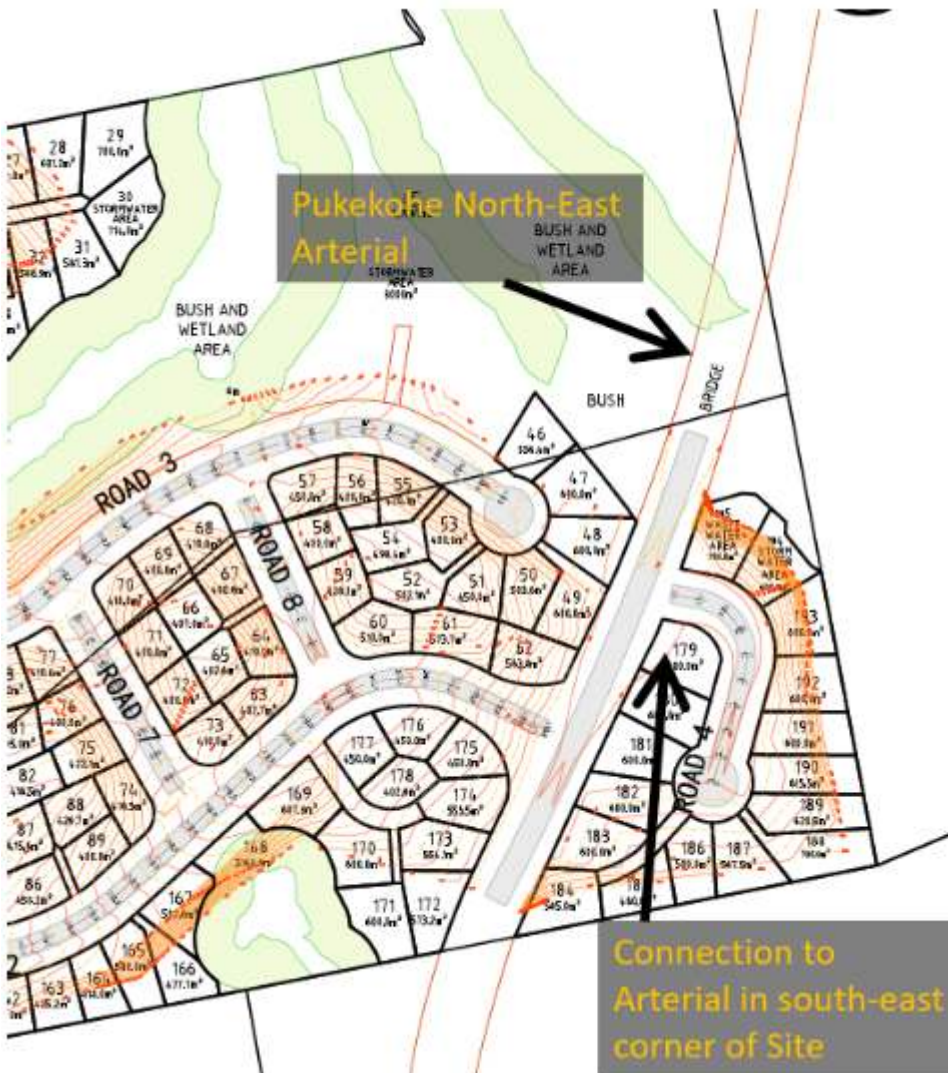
Proposed roading connection of Site to Pukekohe North-East Arterial
